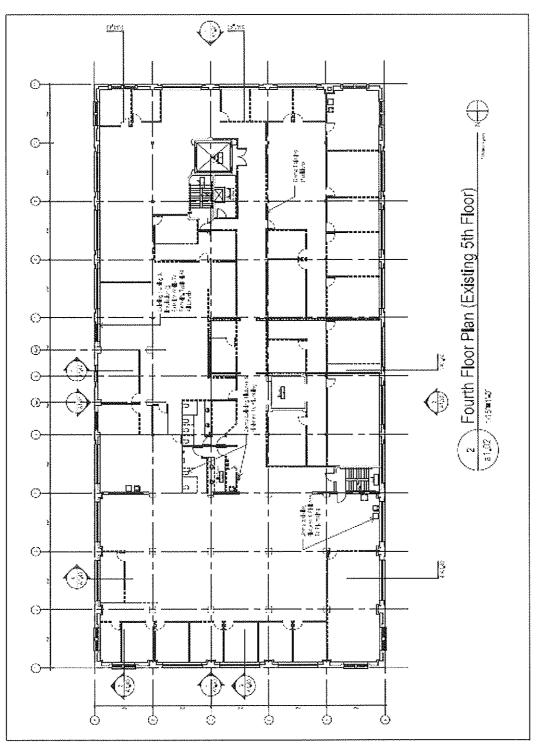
Floor Plans, As Built, Basement (Sub-basement) through Floor 4 (Floor 5)
